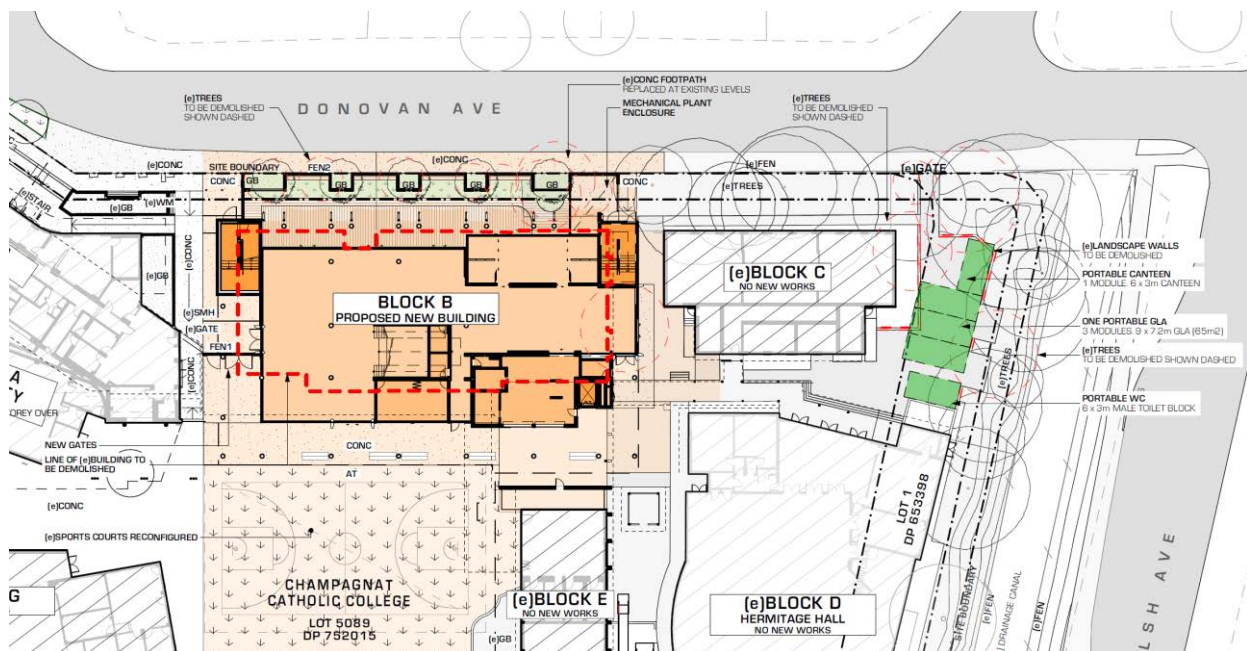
Proposed Site Plan, SD1100, Issue A, (Quinn O’Hanlon Architects, 25 September 2019).
